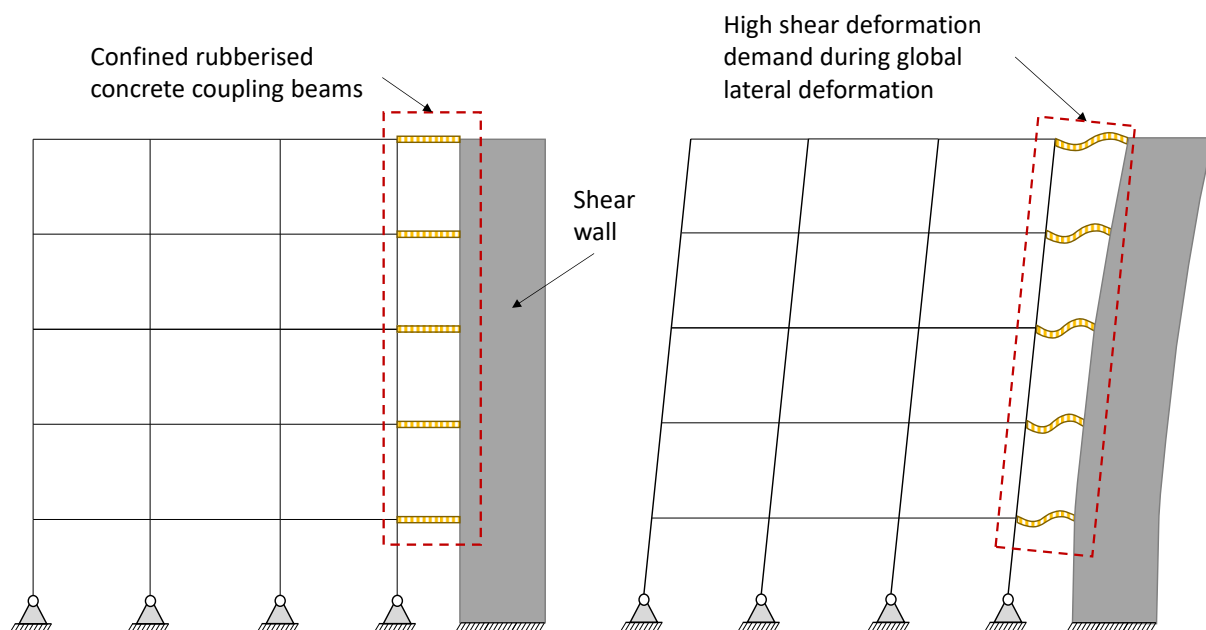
Undeformed and deformed shape of a moment resisting frame connected to a shear wall with confined rubberised concrete shear links
